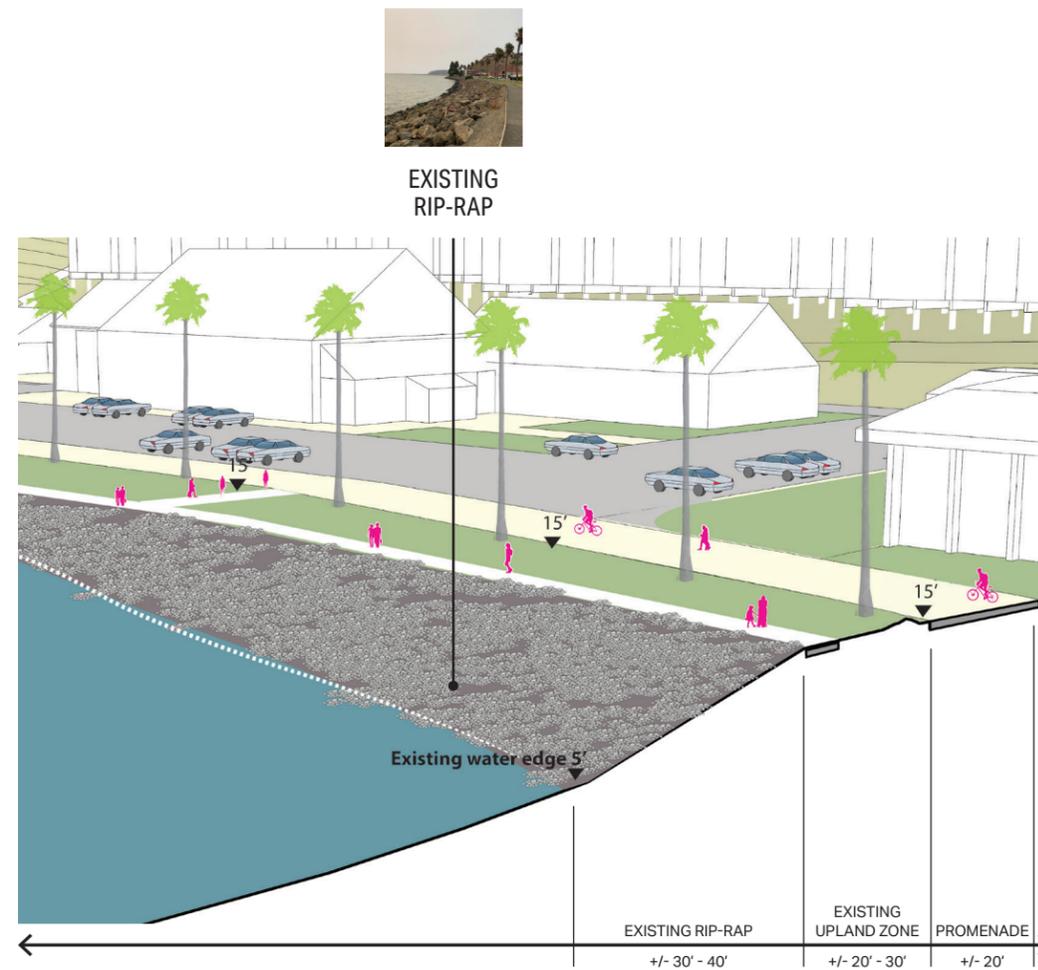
PROPOSED SHORELINE SECTION (2025)
